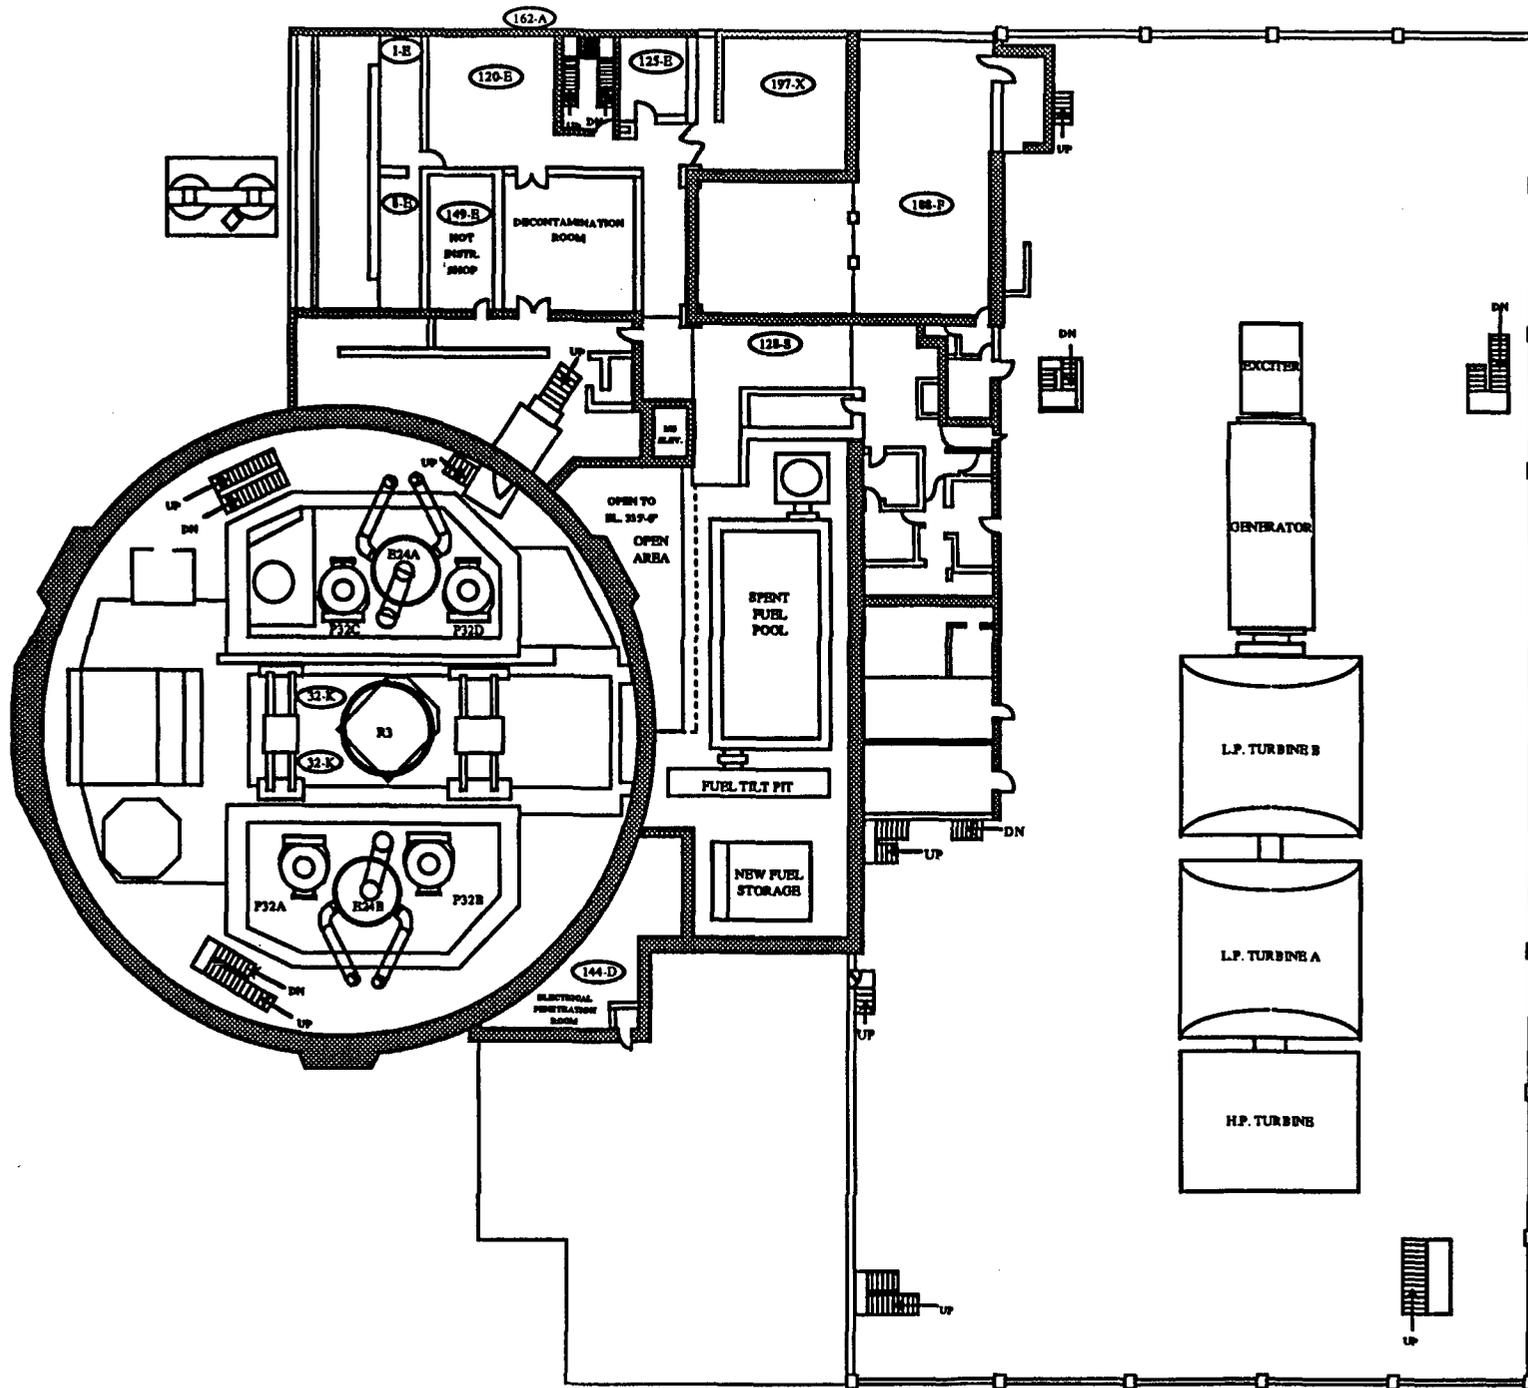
FIRE ZONES ON ELEVATION 386'
